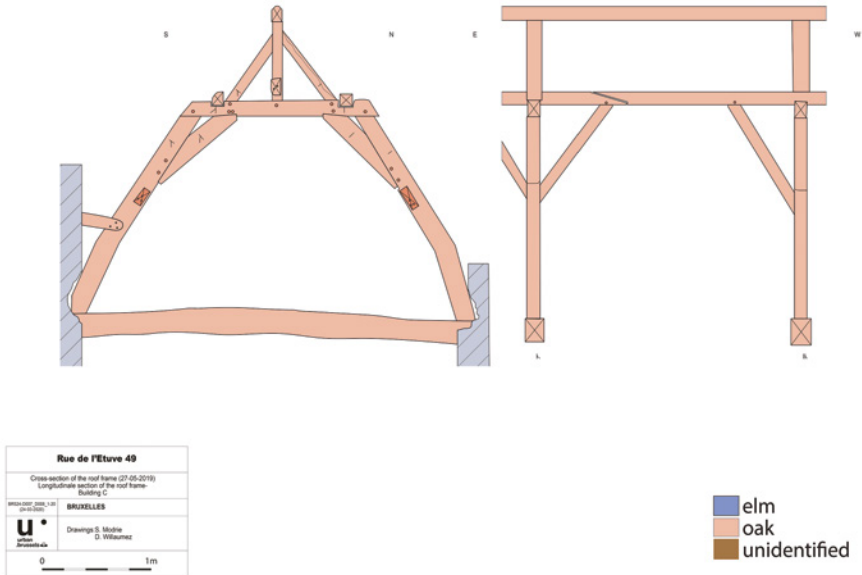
Cross and longitudinal sections of the roof frame in Building C. Distribution of species located on the archaeological surveys of the roof truss I and between I and II, rue de l'Etuve 49–51, Brussels
